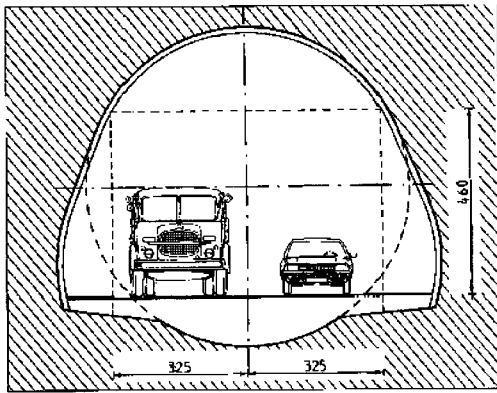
Cross section of the double lane road tunnel in No. 6 Floyfjellet (after Blindheim, 1998)
